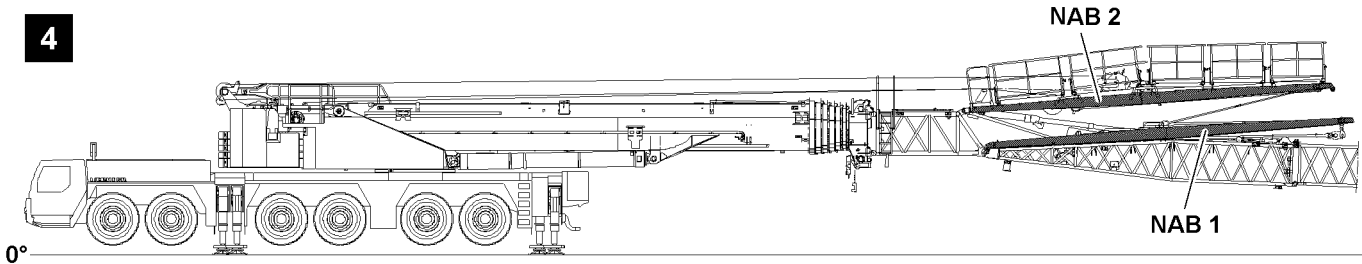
Guying in transport receptacle(s) and NA-frames placed down to the front (example telescopic crane)
